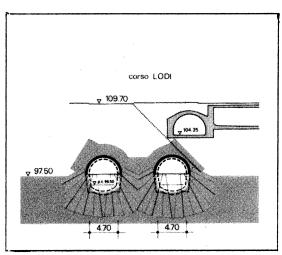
Permeation grouting fromsurface (to g.w.l.) plus steel micropiles for underpinning, followed by grouting from pilot under gwl. Milano Metro
